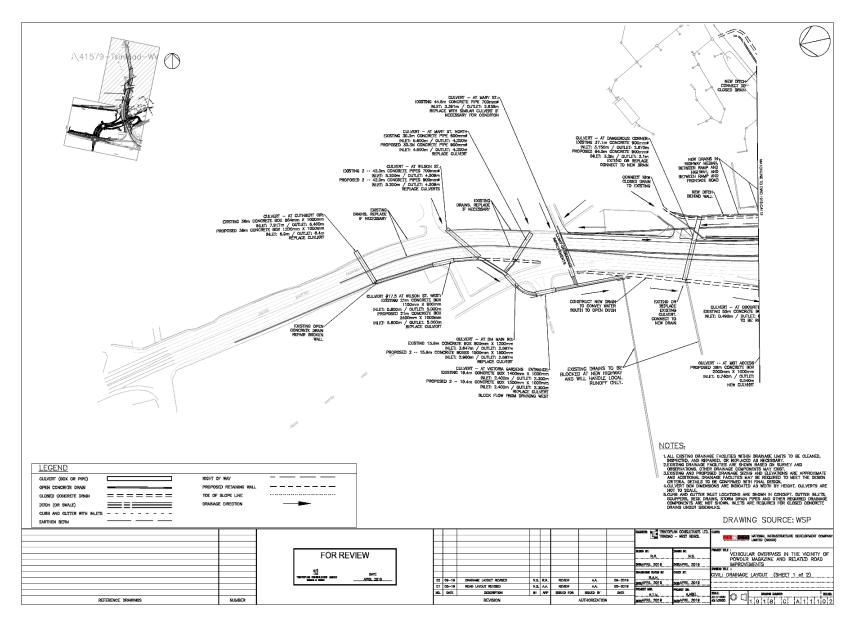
Key Component 5 Road and Drainage Layout Pt 1
